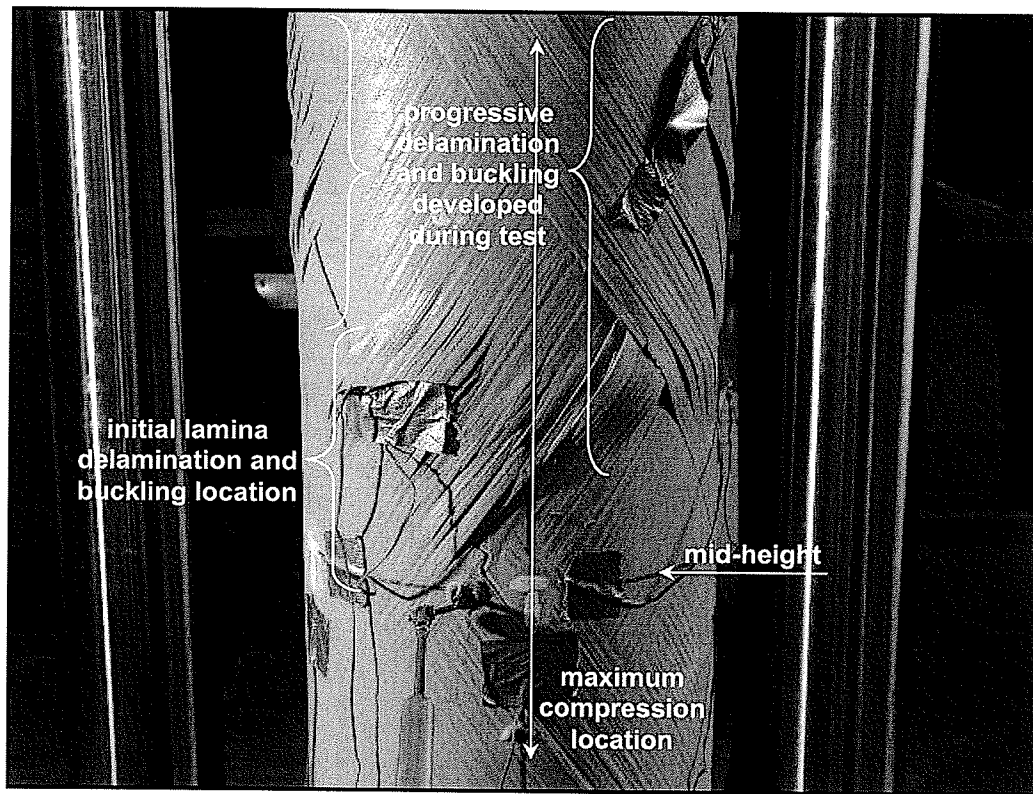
Maximum compression face of specimen BC-P-e30 at failure.
